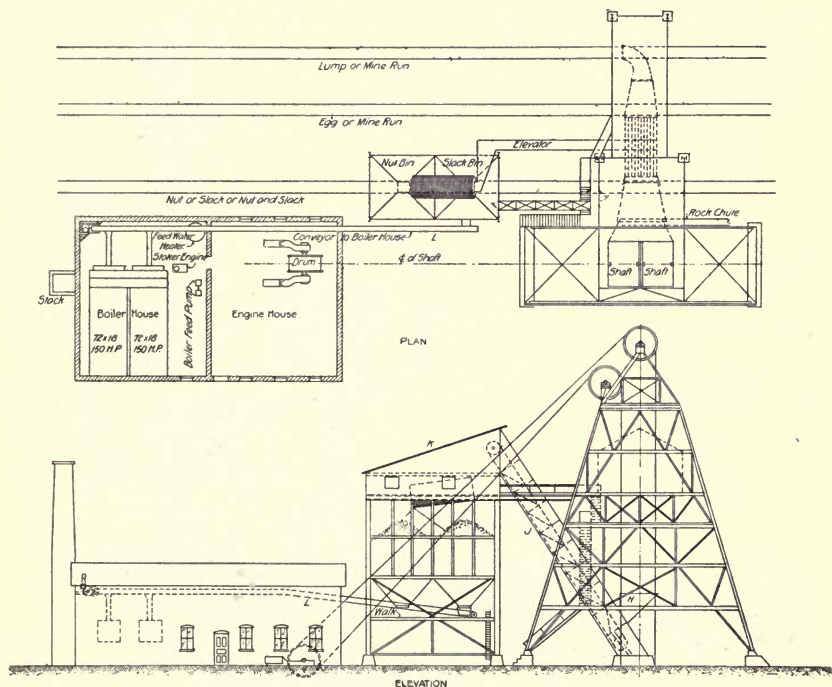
GROUND PLAN AND END ELEVATION OF CLASS II TIPPLE.
